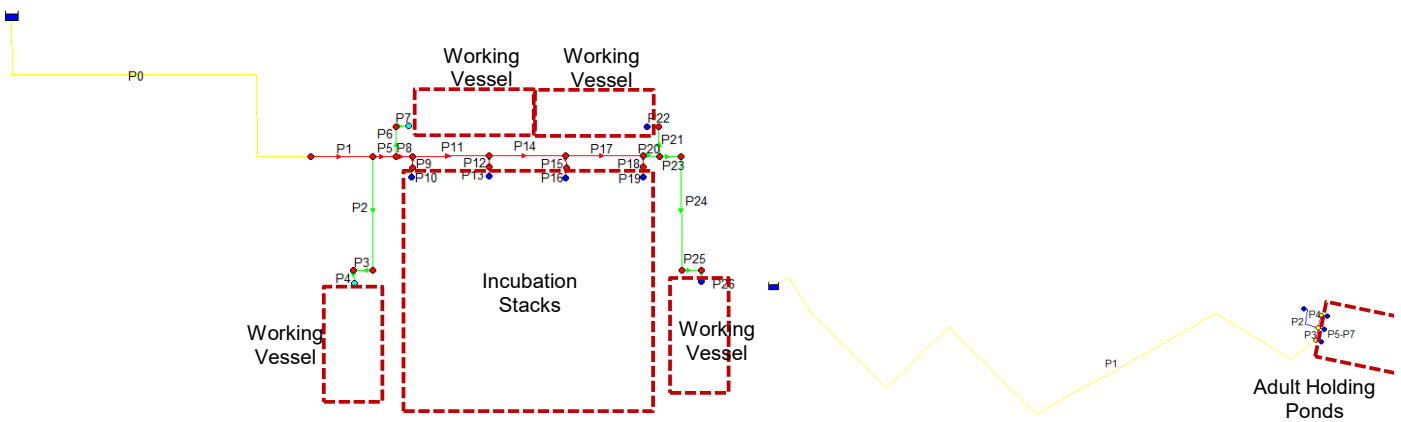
Pipe Naming Convention (Chinook Incubation Building)
